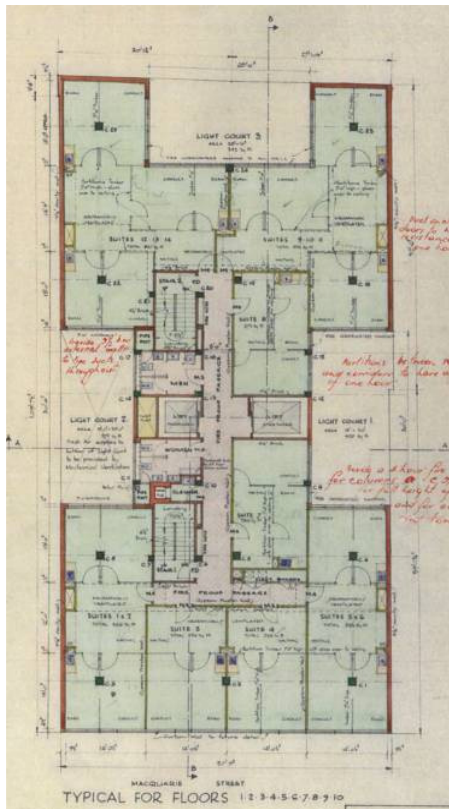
Typical upper floor plan showing Three light wells and small suites
